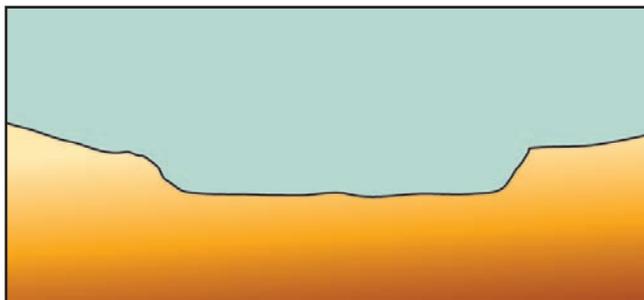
Entrenched road segments are prevalent on Forest Service roads.
